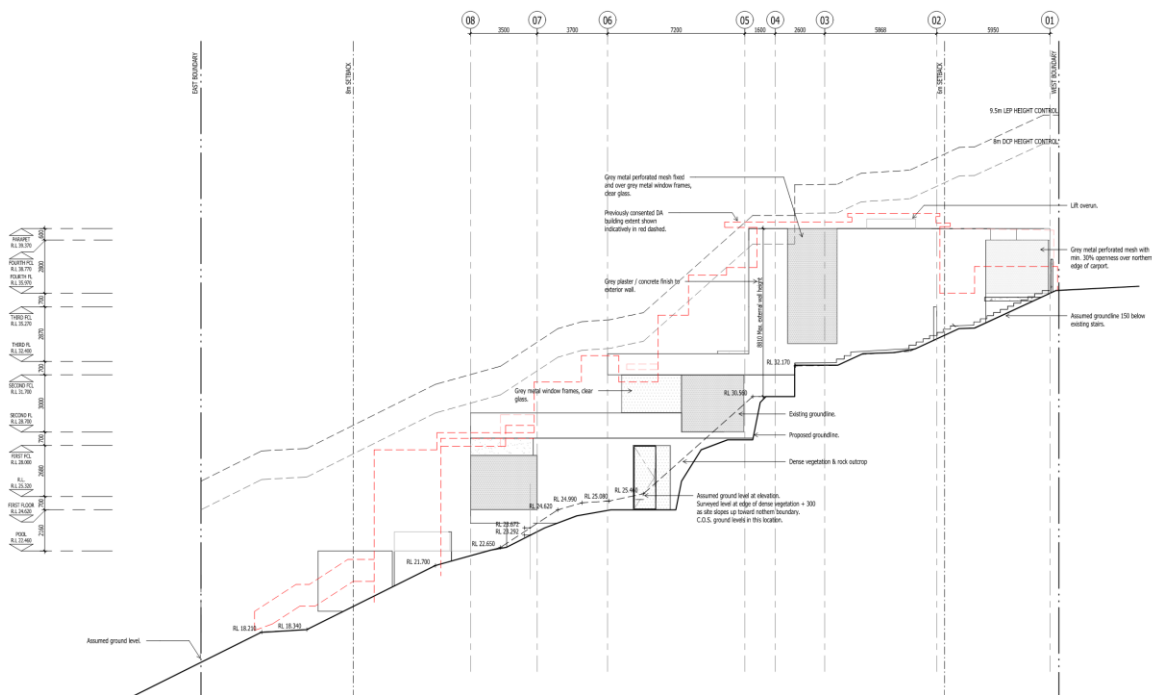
Northern Elevation showing non-compliant external wall height area dashed in red line
